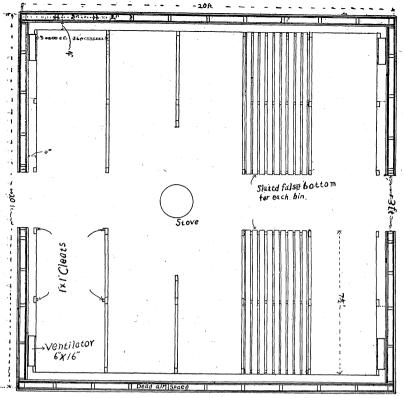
Floor plan, 20x20 curing and storage house. Capacity, 1250 bushels.
